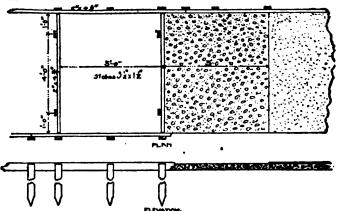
Layout for Lumber Forms In Ordinary Sidewalk Construction.
